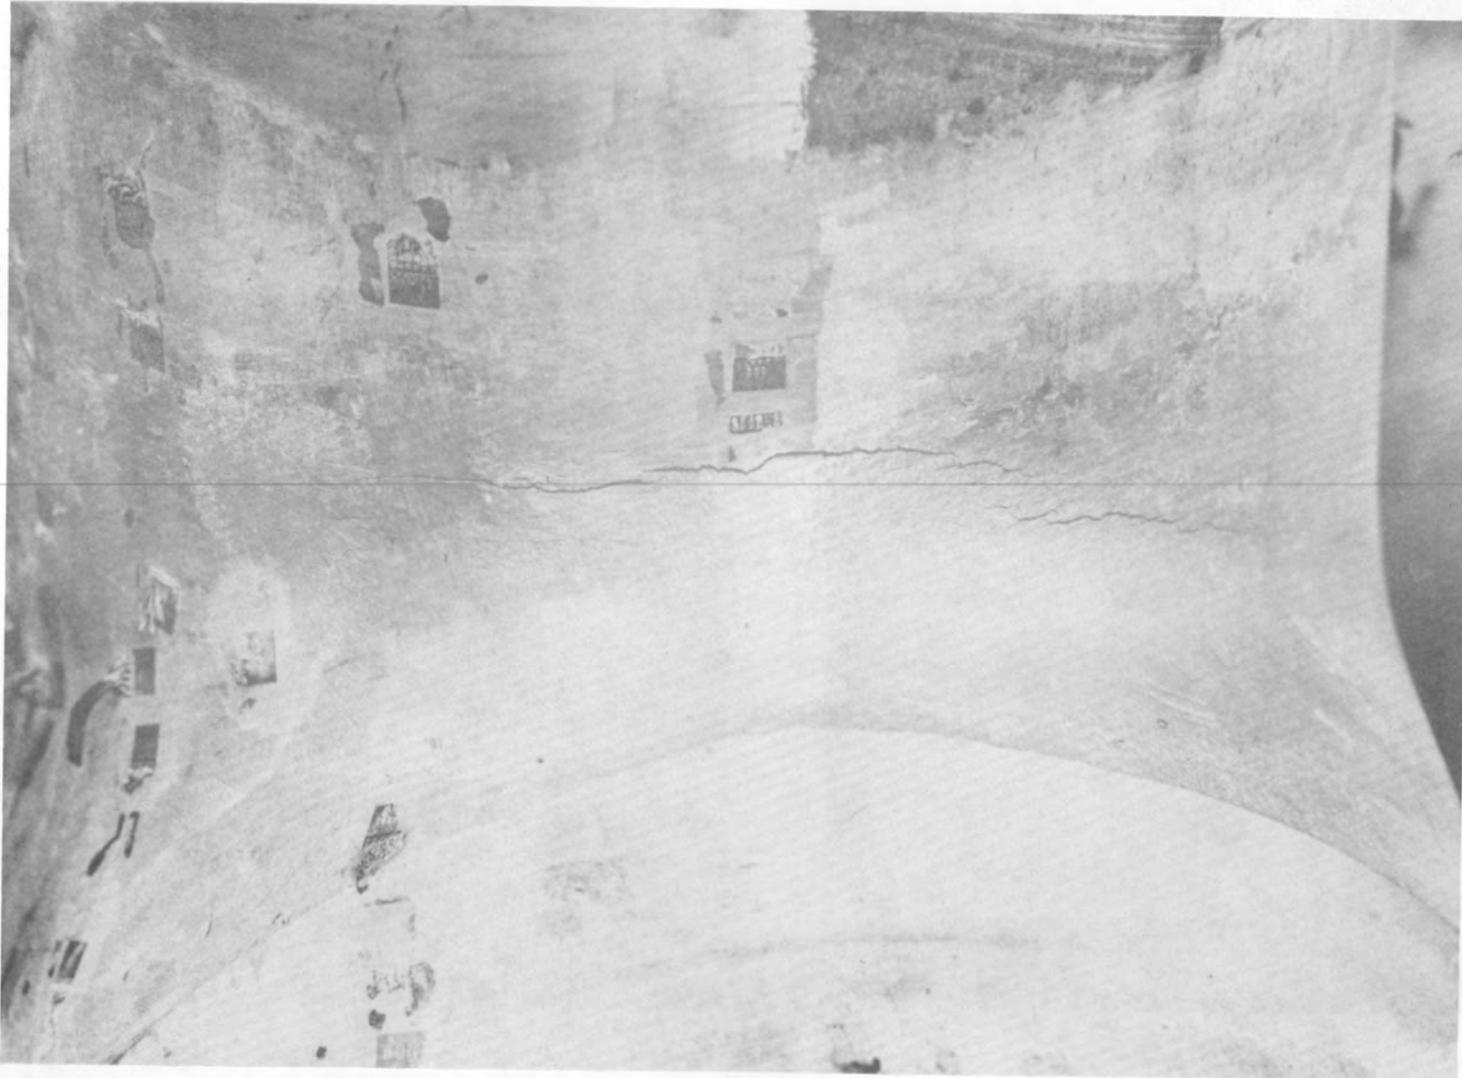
Fatigue cracks in T-7 after failure at 11,475 cycles.
